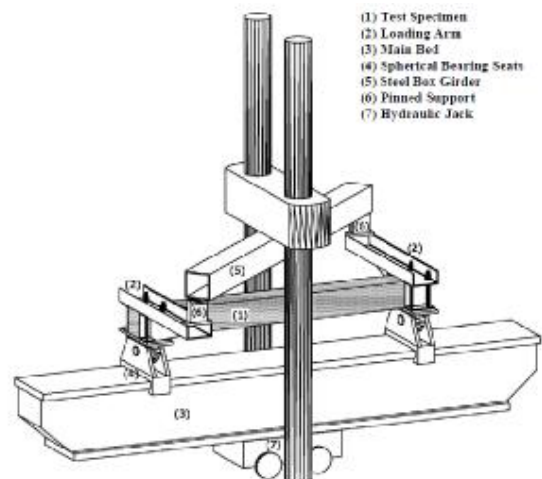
Test setup & Arrangement Specimens and Instrumentation.
